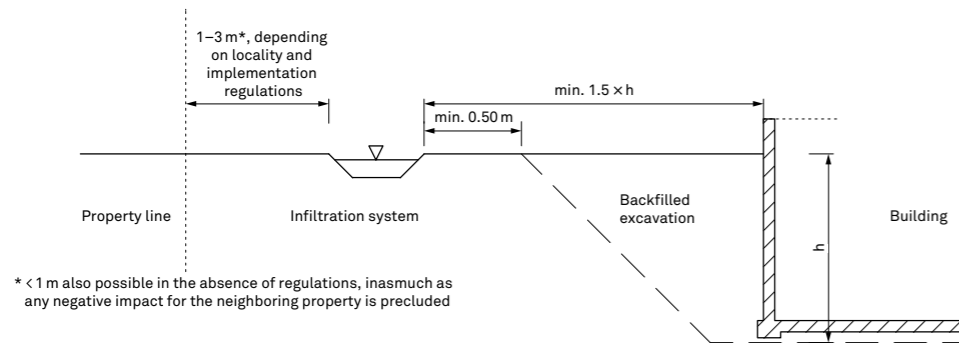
Minimum distance between decentralized infiltration systems and buildings without hydrostatic pressure resistant waterproofing
